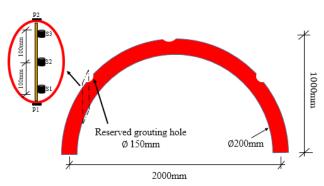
Dimensions of the steel tube specimen and the location of the transducers
